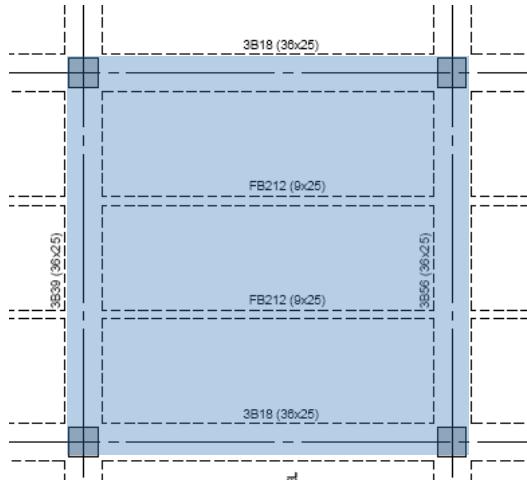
| Typical Bay from Third Floor Area D Floor Plan (Walter P. Moore)
